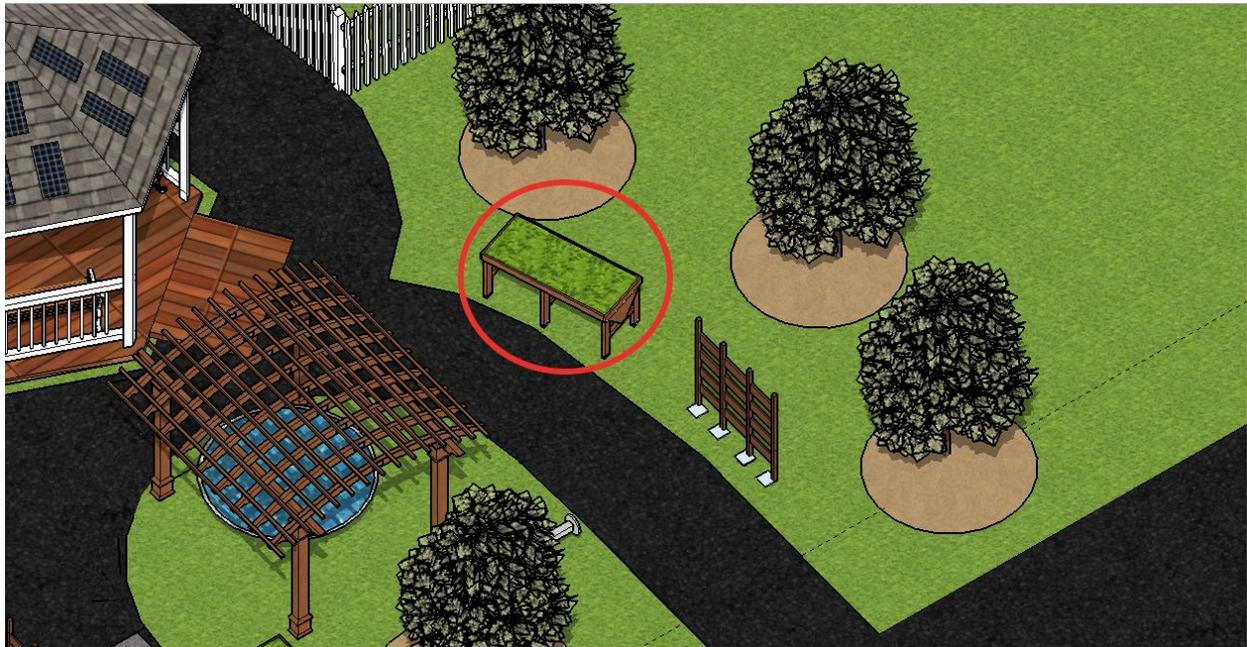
Potential placement for elevated garden bed, located in front of gazebo, on right flank walkway.
